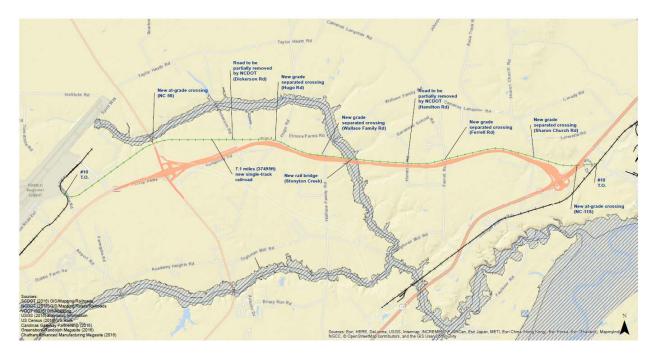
Conceptual Alignment of Future Secondary Rail Connection Adjacent to CF Harvey Parkway Extension
